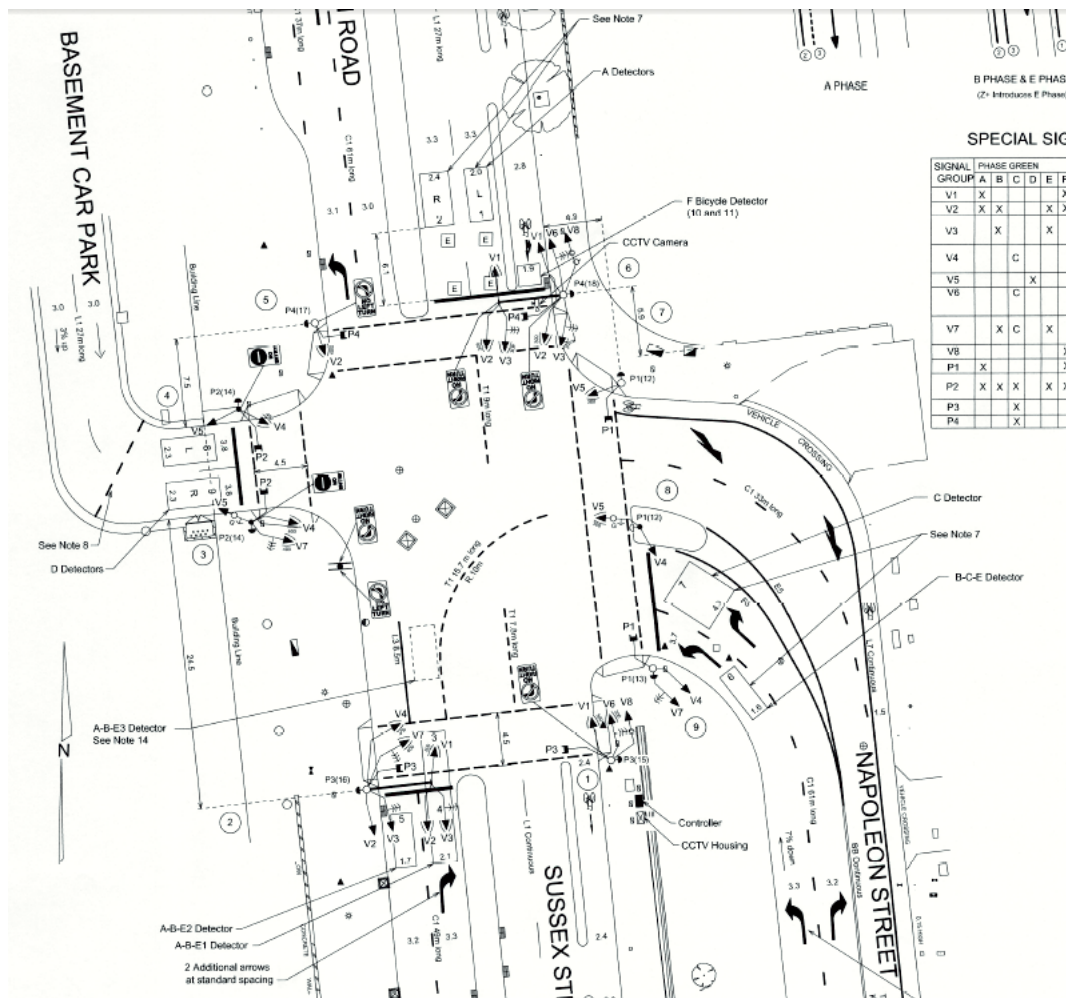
Approved intersection layout – Hickson Road / Napoleon Street
